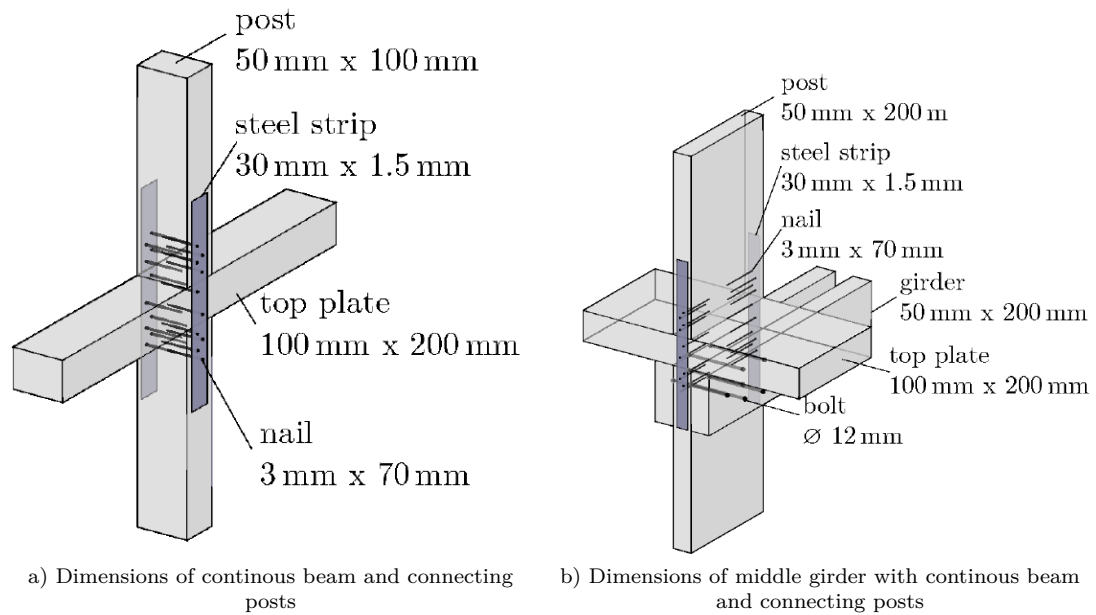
Detailed dimensions of the wall girder connection in the floor level with steel strip connections
